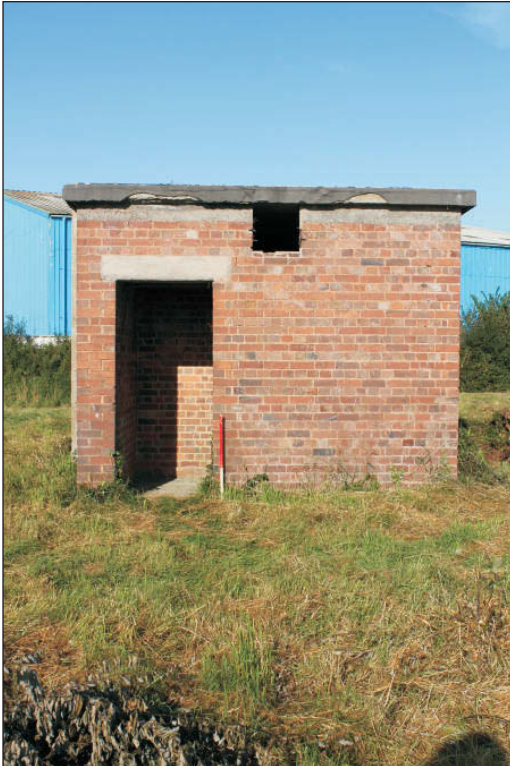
The crew sleeping shelter – the east elevation showing the entrance viewed from the east. 1m scale
